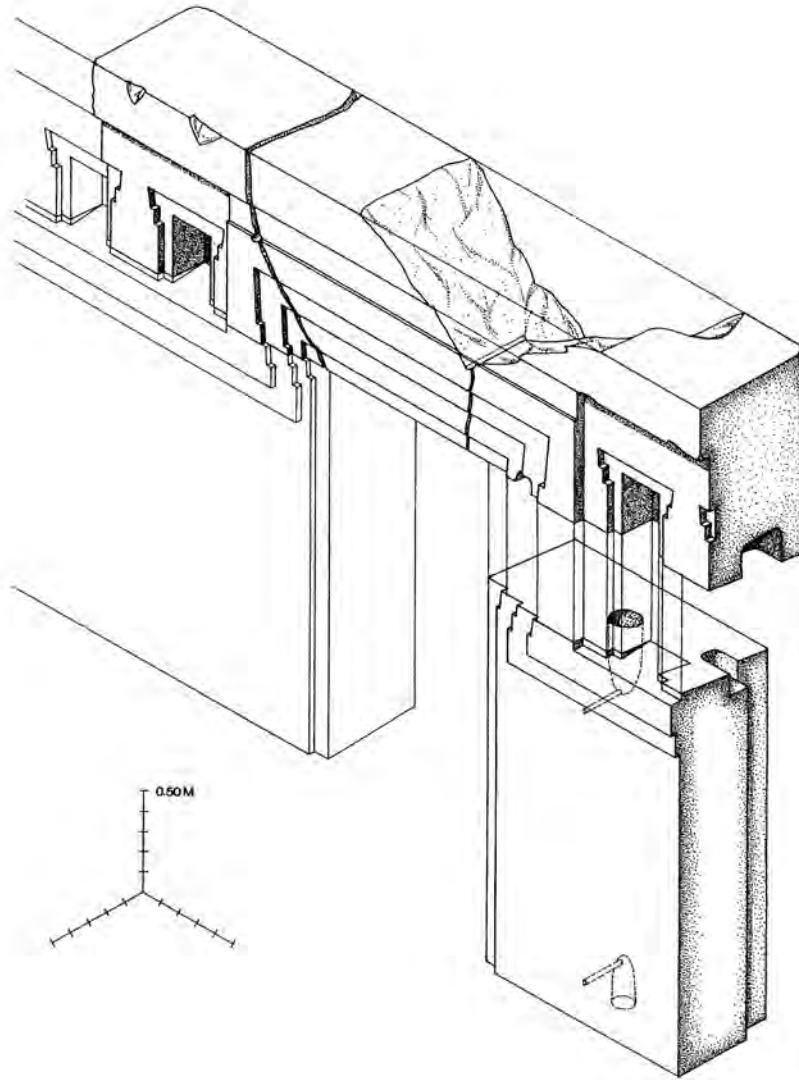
Construction of Akapana Gateway (drawing by Jean-Pierre Protzen).
